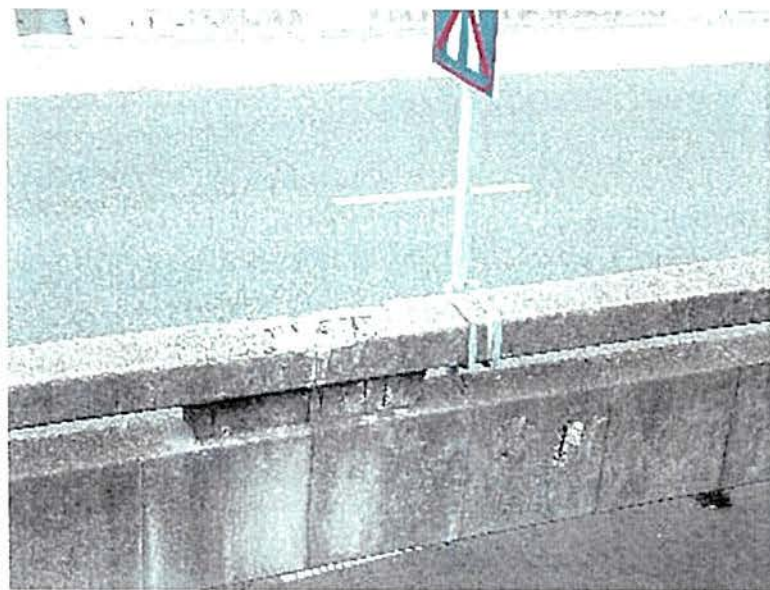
Extensive spalling and rebar corrosion on the Foreshore Freeways, Cape Town (2015)
